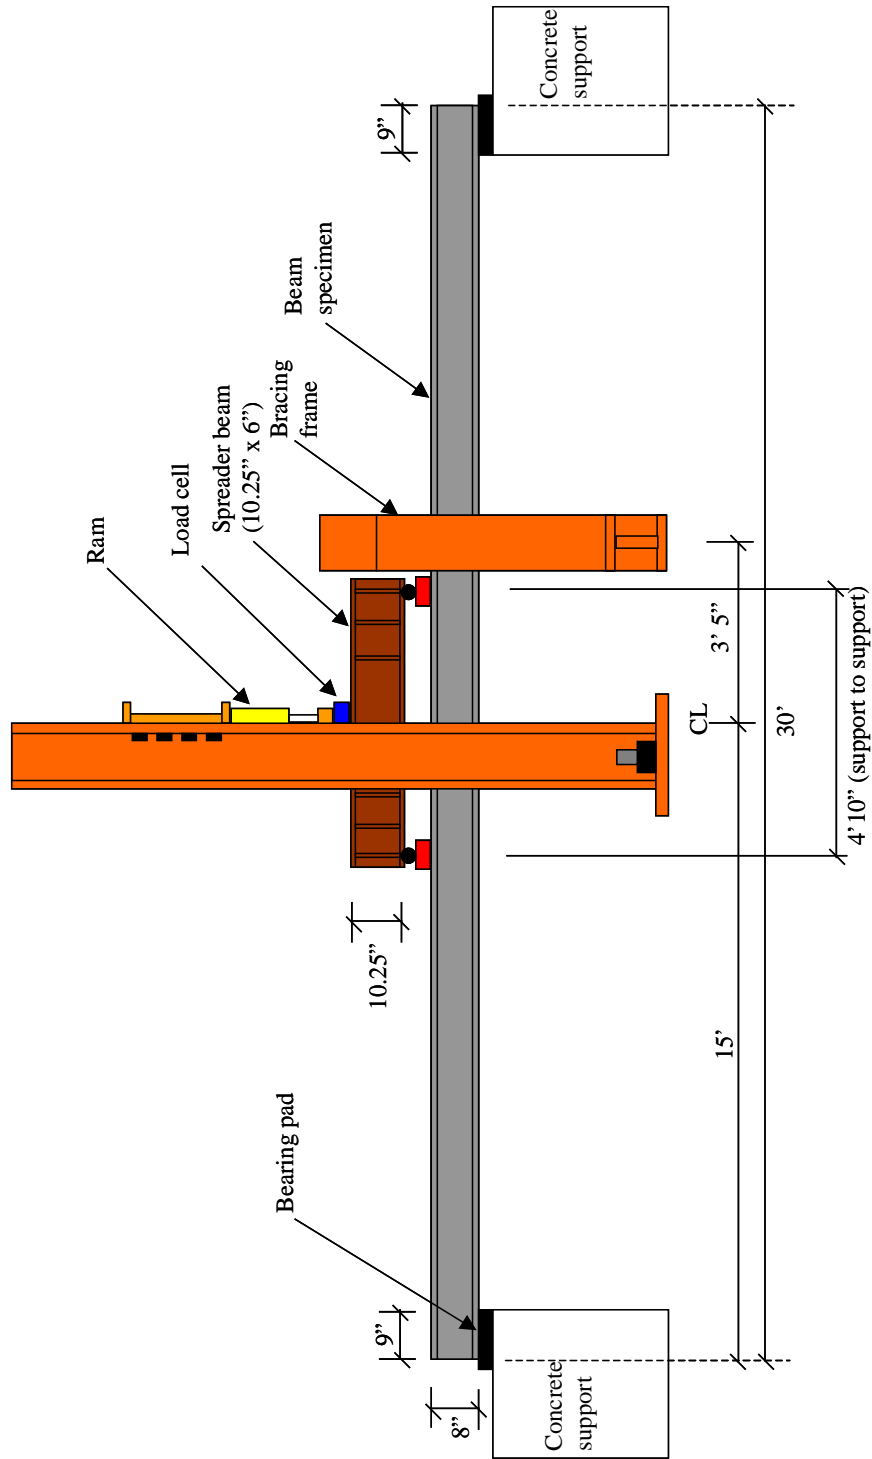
Four-Point Bending Test Setup and Dimensions of Specimen SW2
